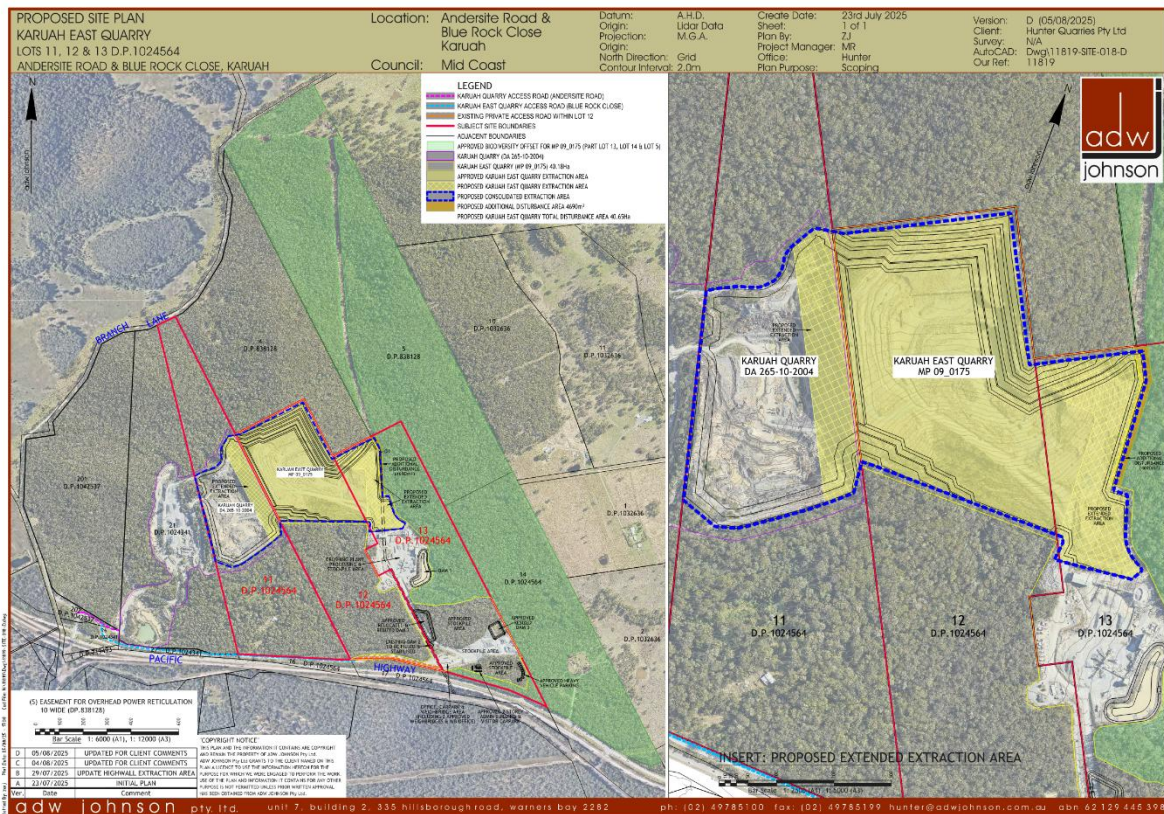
Proposed Site Plan Karuah East Quarry with Project Area in orange. (Source: ADW Johnson)
